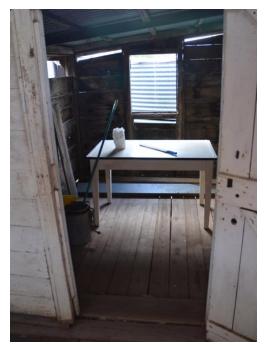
Interior of the small room of unknown use created through the addition of a skillion–roof extension.
